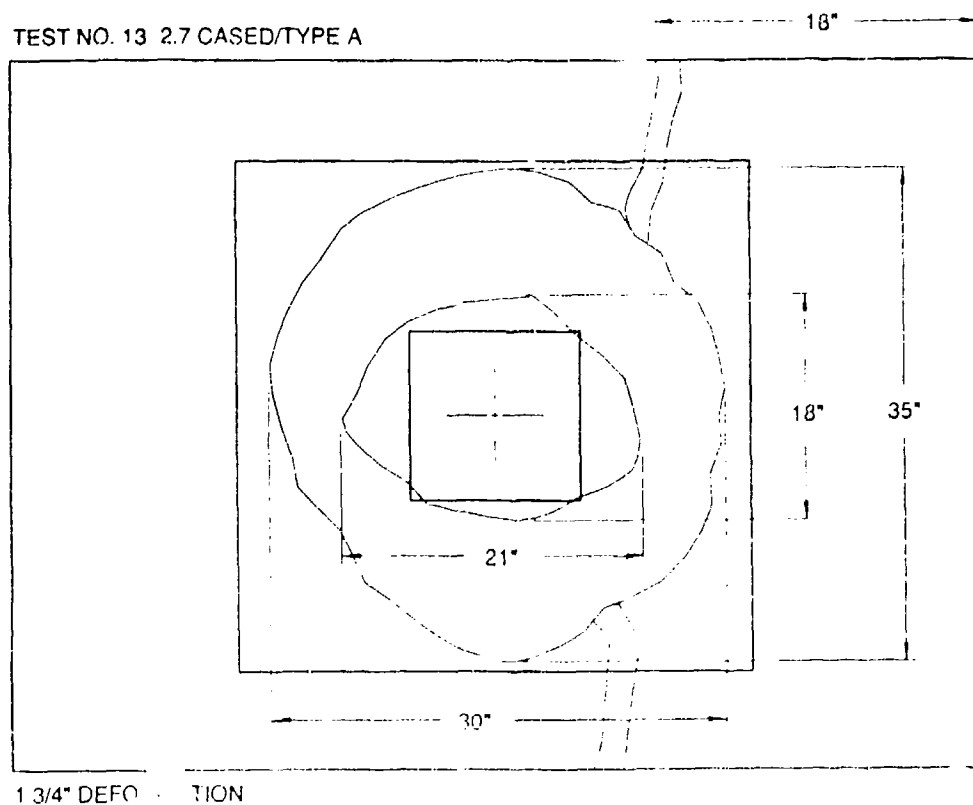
A Schematic of Test 13 Wall Damage (Type B, 2.7-Pound Cased Charge).
